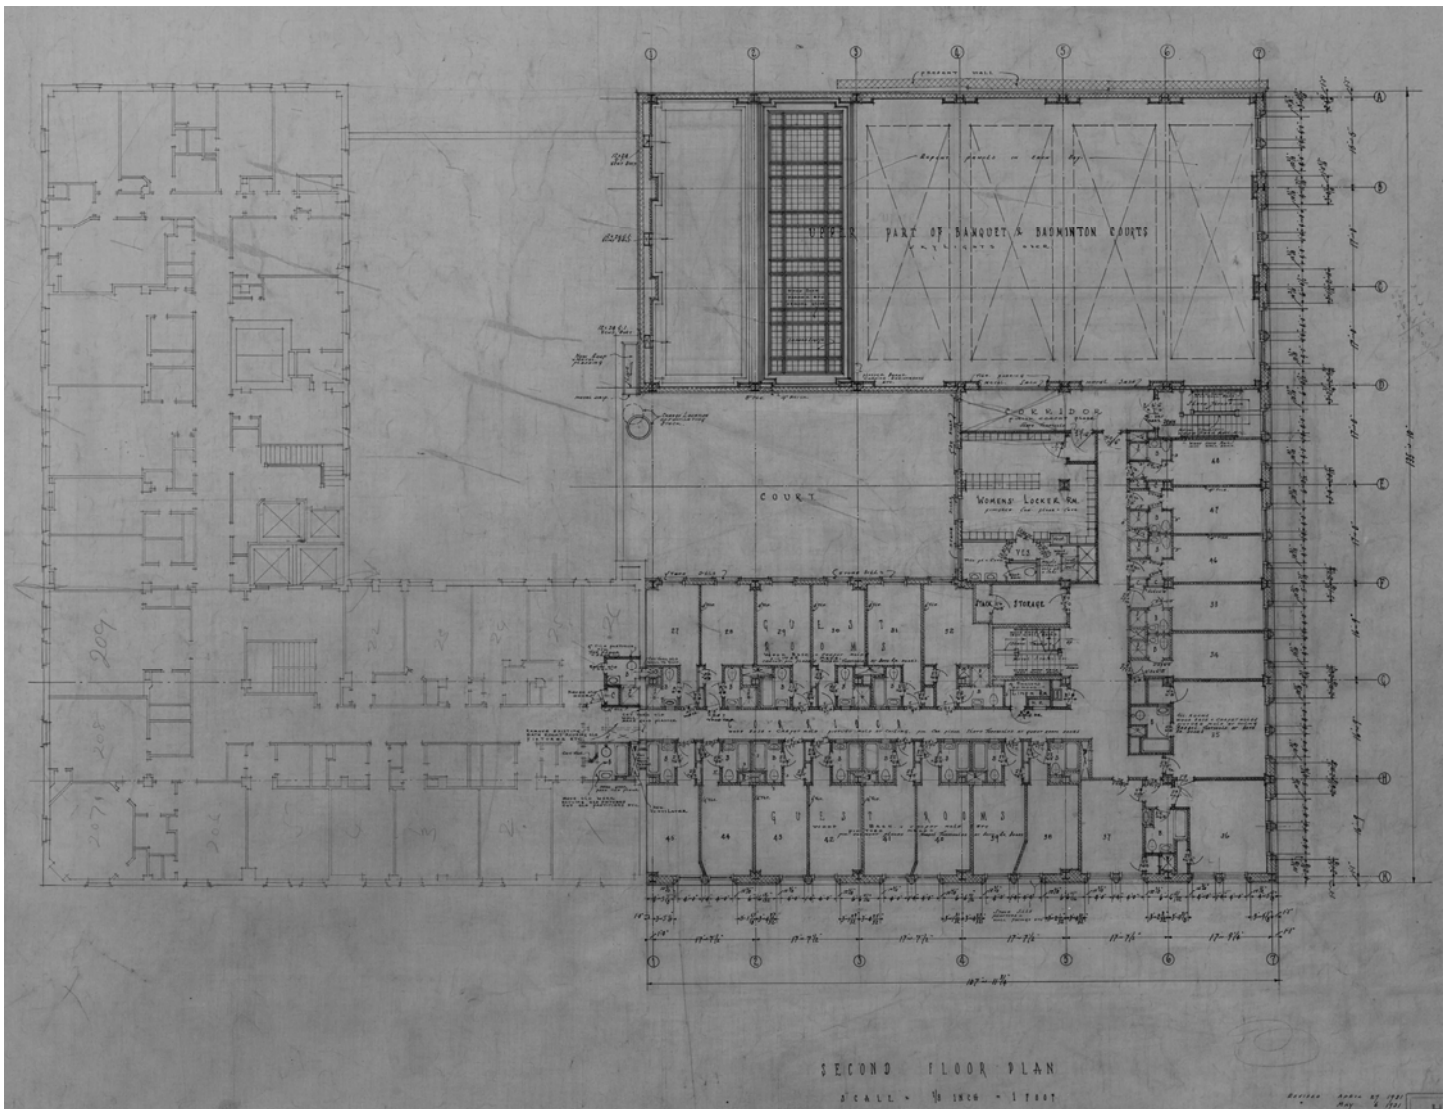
Hutton & Souter, Architects, "Plans of Alterations and Additions for Royal Connaught Hotel Hamilton," 27 Apr. 1931, Souter, Bell, Howard and Souter Fonds, Archives of Ontario, C12-1-0-458, Container # L-717, Barcode B732587, Drawing No. 4 – Second Floor Plan.
